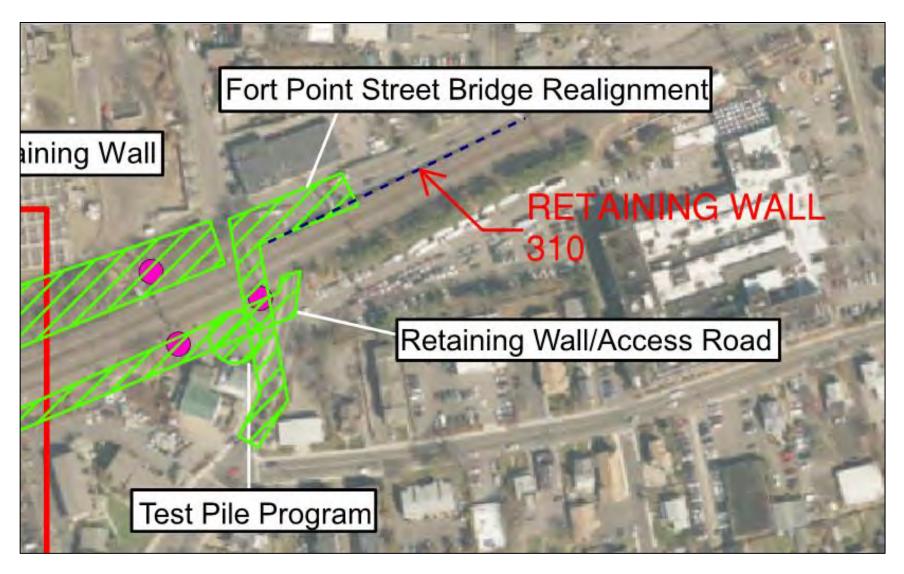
Retaining Wall 310 at Fort Point Street, east of the Fort Point Street railroad bridge.
